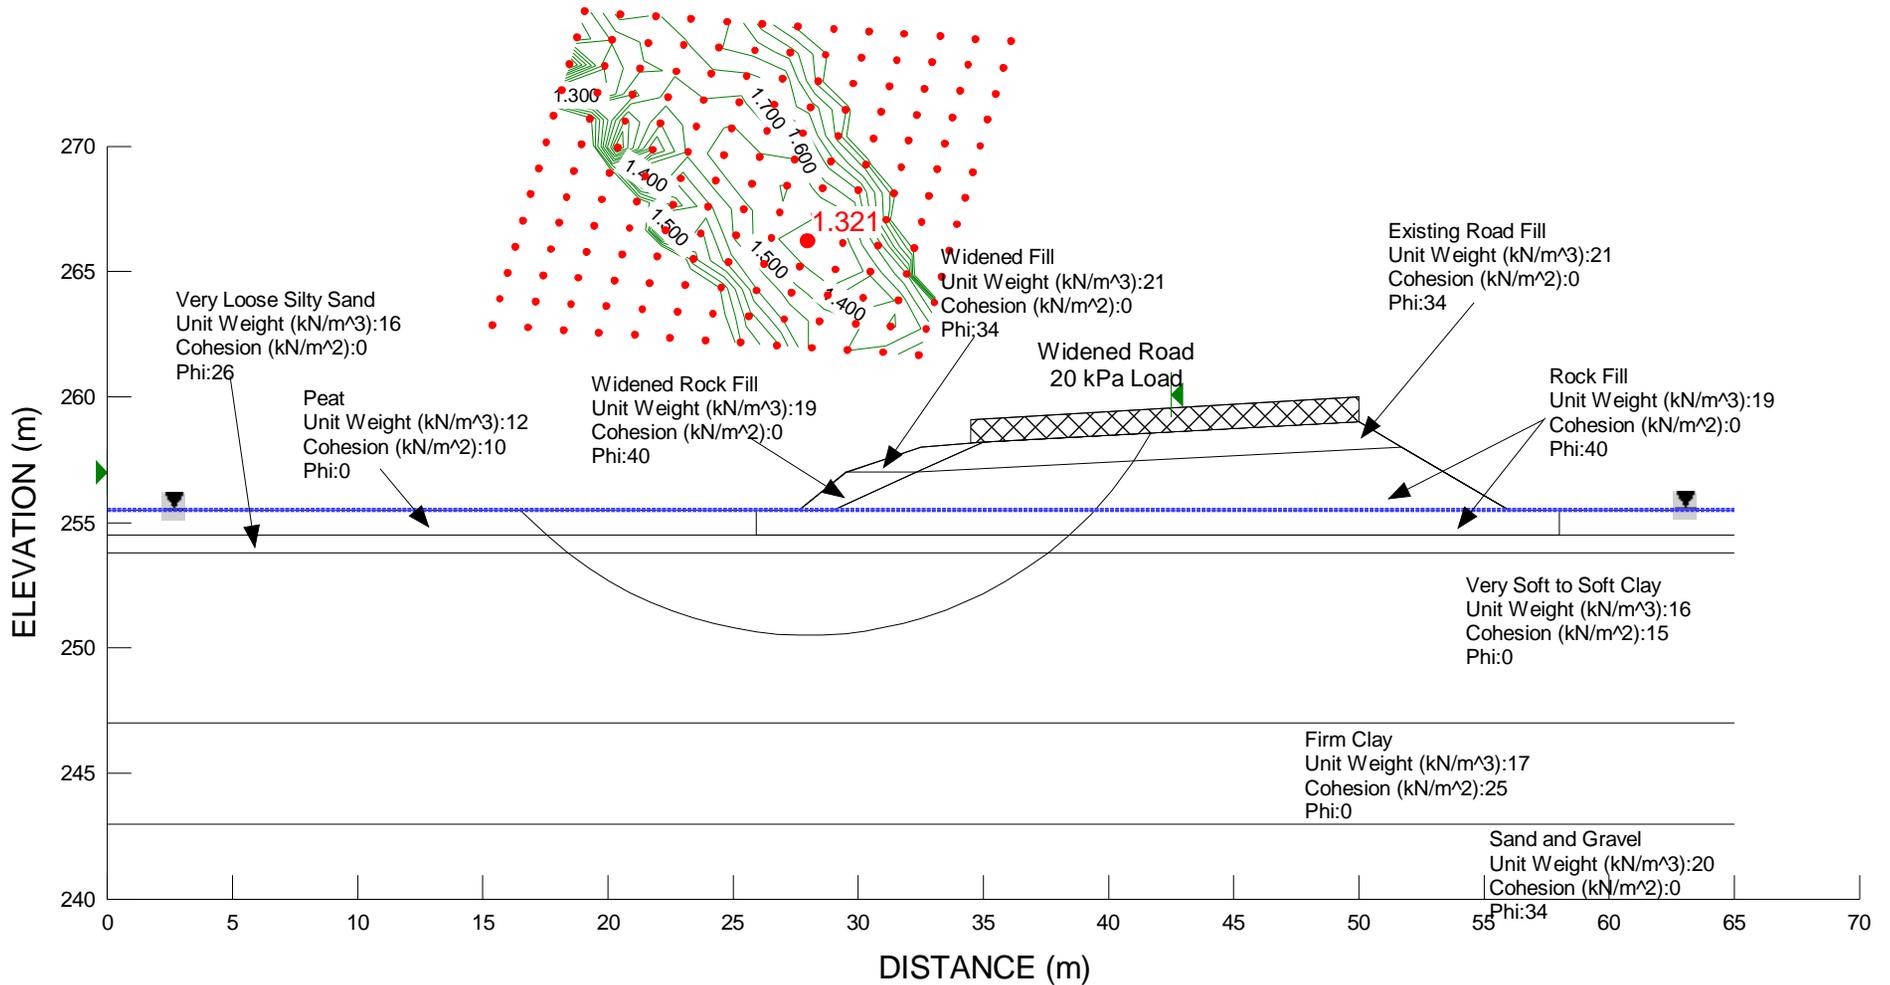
Slope Stability Analysis of Section at Station 19+100 with 2.5 m Road Widening (End of Construction - Slip Surface within Westbound Lane)
